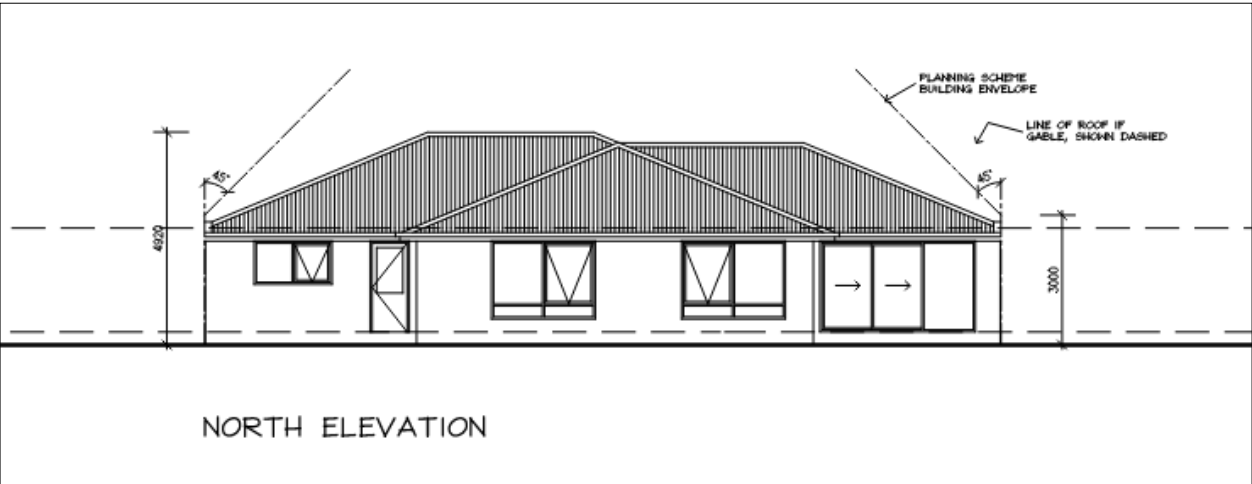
North elevation (Steven Penton Building Design, 2022)
